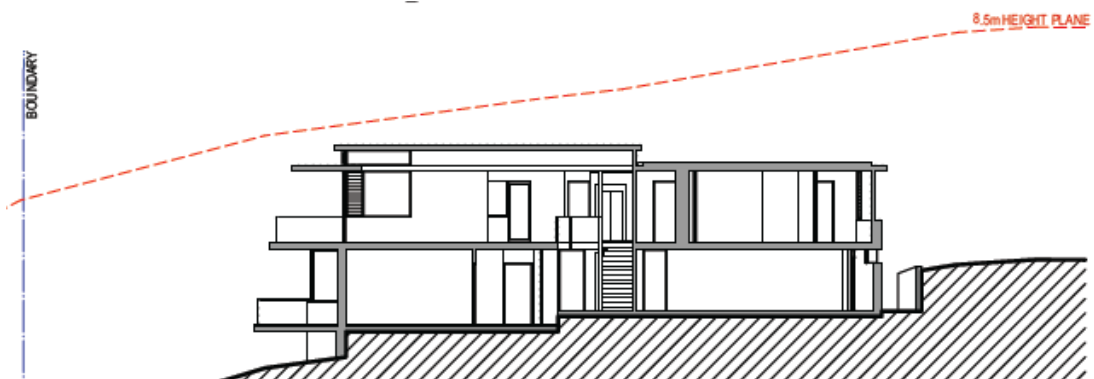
Section of 8.5m building height plane over site (fully complies)
